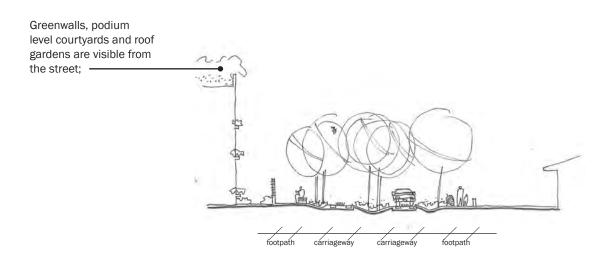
Indicative Plan and Section High Volume Streets - Stephenson Avenue
